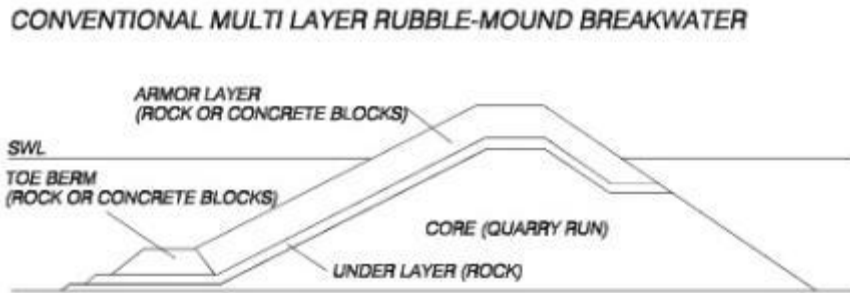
Rubble mound breakwater (U.S. ARMY CORPS OF ENGINEERS, 2002).
